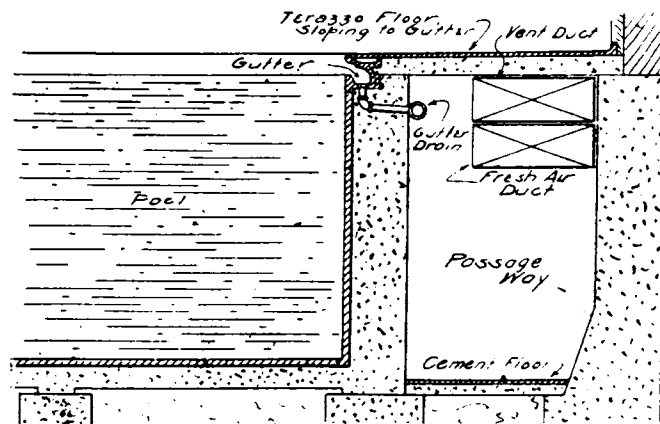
Sketch Showing the Construction of Gutter Running Around Swimming Pool Outlined in Fig. 1
